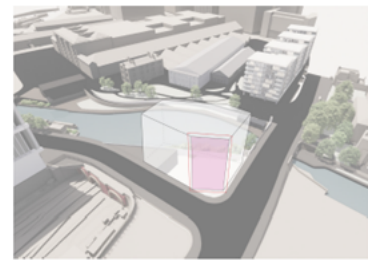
Increase angle of cut - a parallel line to the canal - to create a positive building lines to York Way, creating an opening to Goods Way
